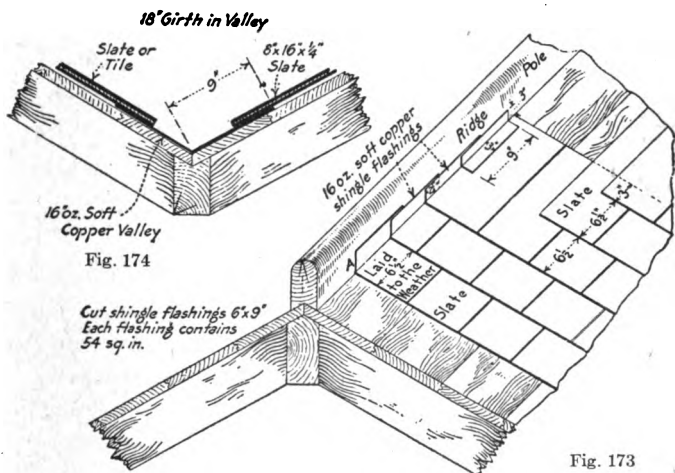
Section Through Hip Showing Flashings Laid in with Roof Covering
